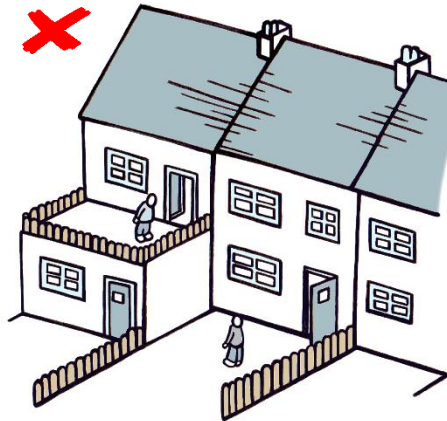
P: Roof Terraces on Terraced or Semi-detached Properties are Unlikely to be Acceptable
